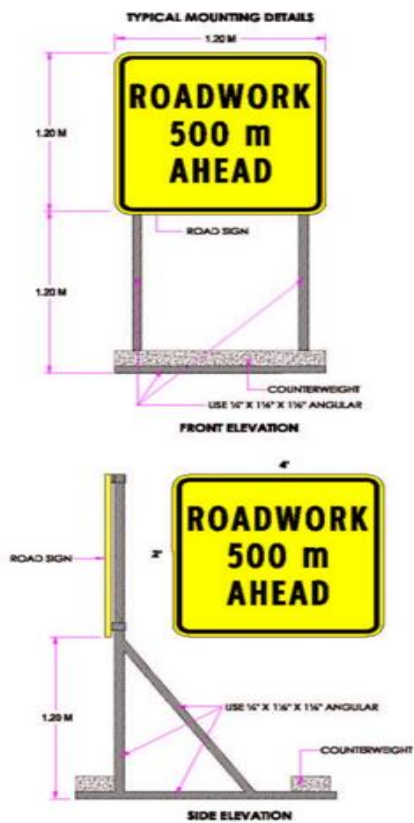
Typical Mounting Details of Signages during TR4 Construction
